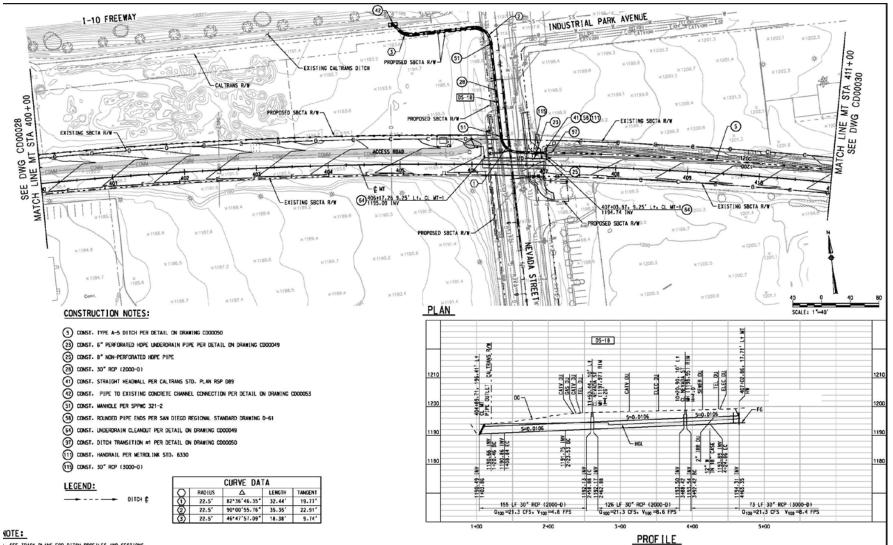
Drainage Connection to I-10 ROW at Nevada Street
